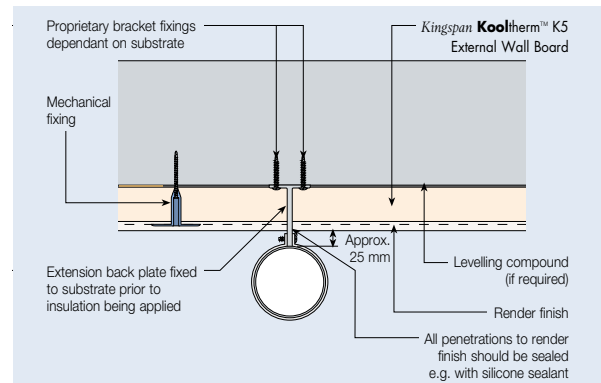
Drainpipe Extension Detail (Applicable to a Variety of External Building Ancillaries)
